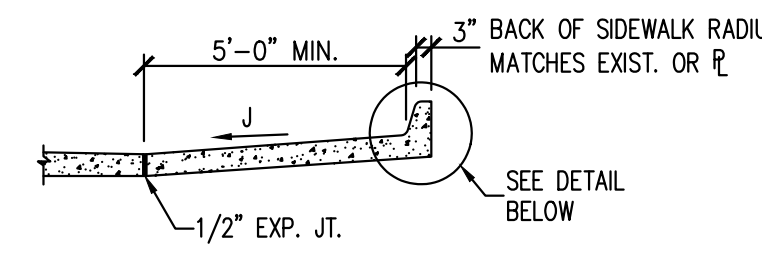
DETAIL A MINIMAL R.O.W. FOR SIDEWALK AT BACK OF CURB PERPENDICULAR RAMP
